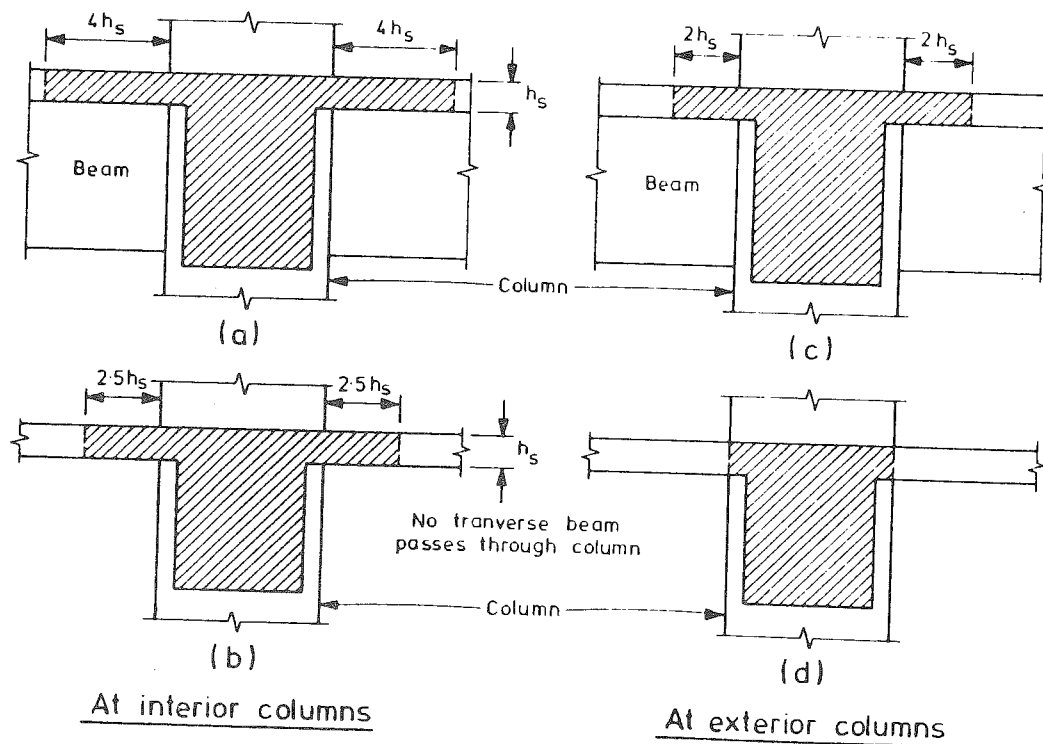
Longitudinal Steel in Shaded Area to be Included in the Flexural Strength of the Beam at Column Face [5].
